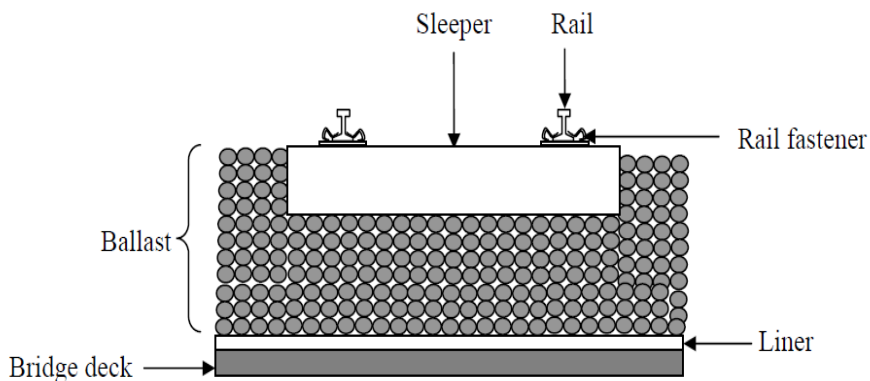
Typical Ballast Track Arrangement on a Bridge[7]
